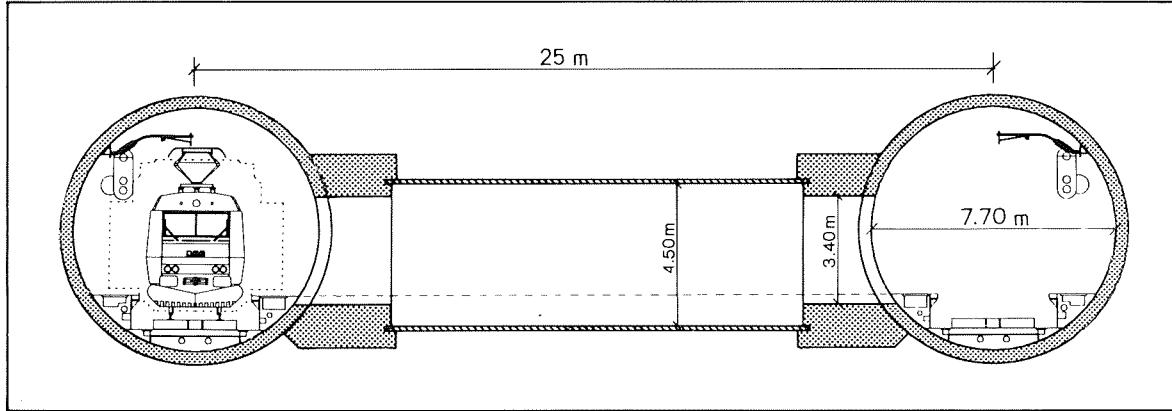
Eastern Railway Tunnel. Cross Section in Bored Tunnel.
